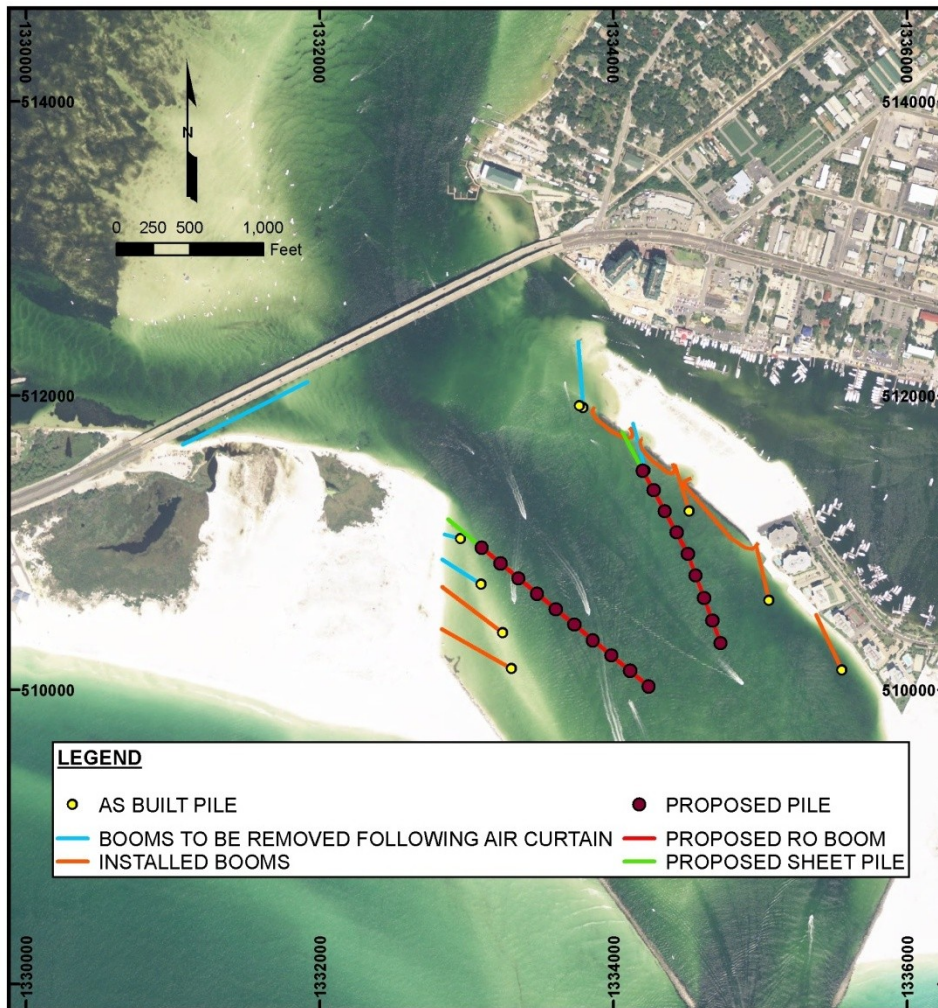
Proposed open chevron Ro-Boom plan for inside East Pass.
